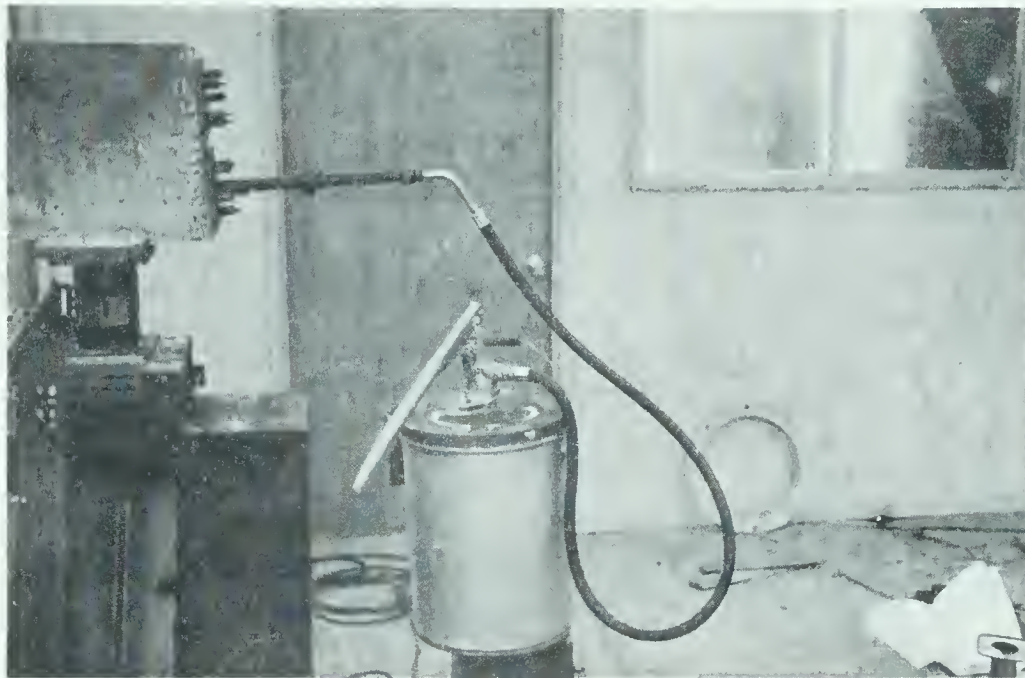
PHOTOGRAPHS SHOWING GROUTING
